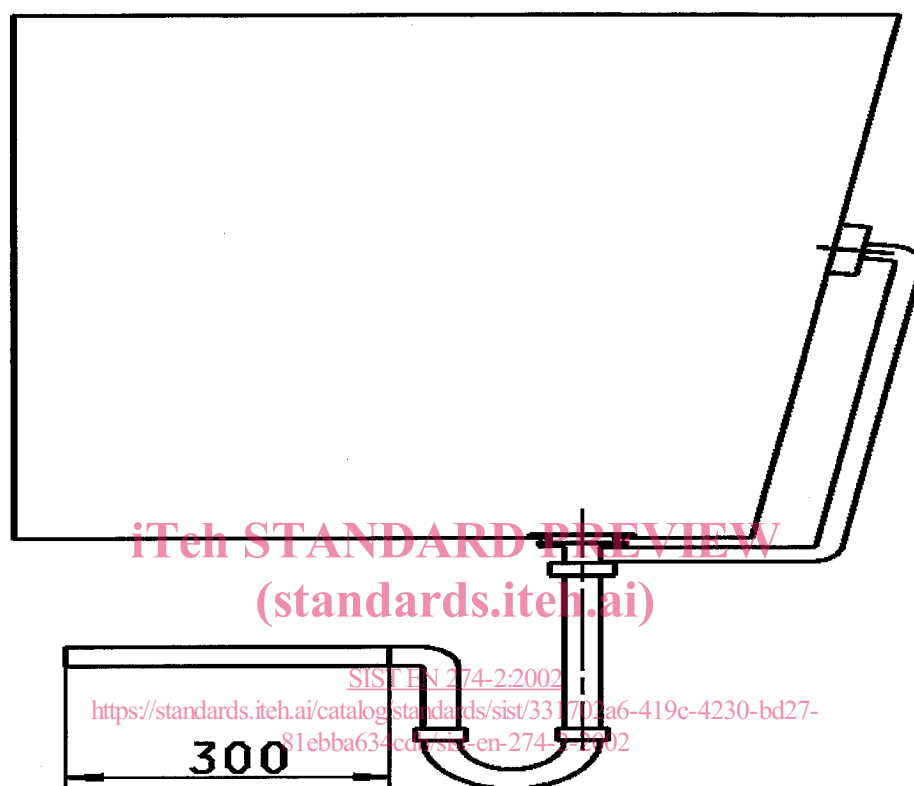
Arrangement for measuring flow rate of waste outlet with a trap
